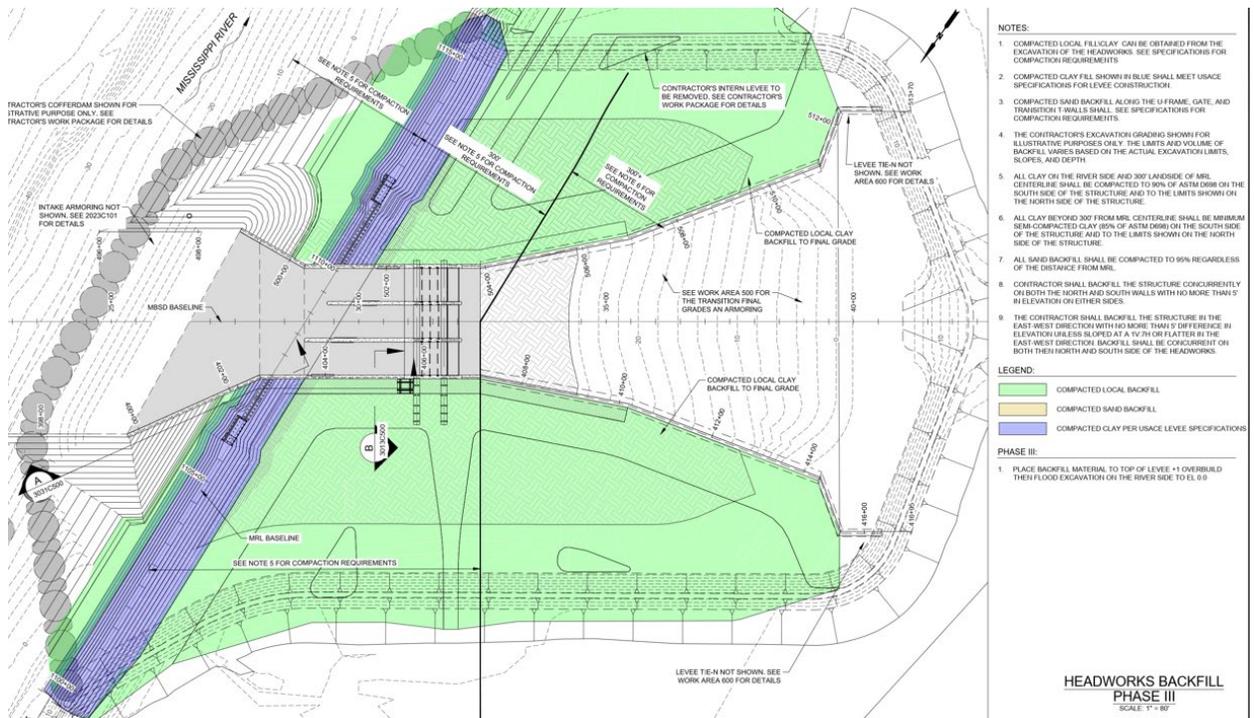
Compacted Local Backfill – Phase III (plan view)
